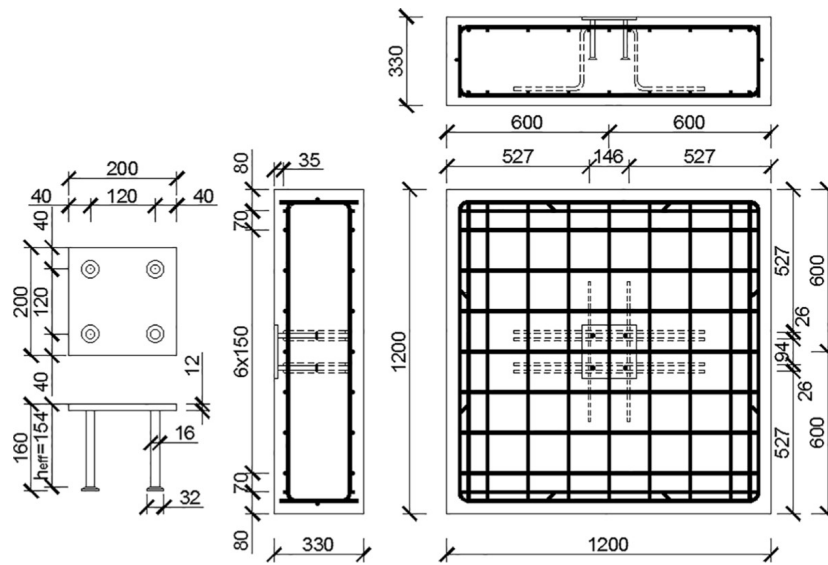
Embedded plate design and reinforcement layout for tension tests conducted by Bujňák et al. (2019)
